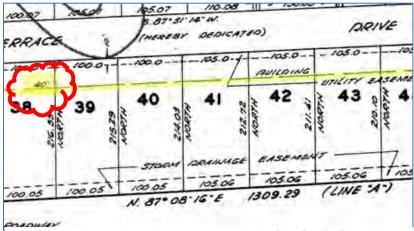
Gaslight Terrace Subdivision Plat showing the forty foot (40') building setback
